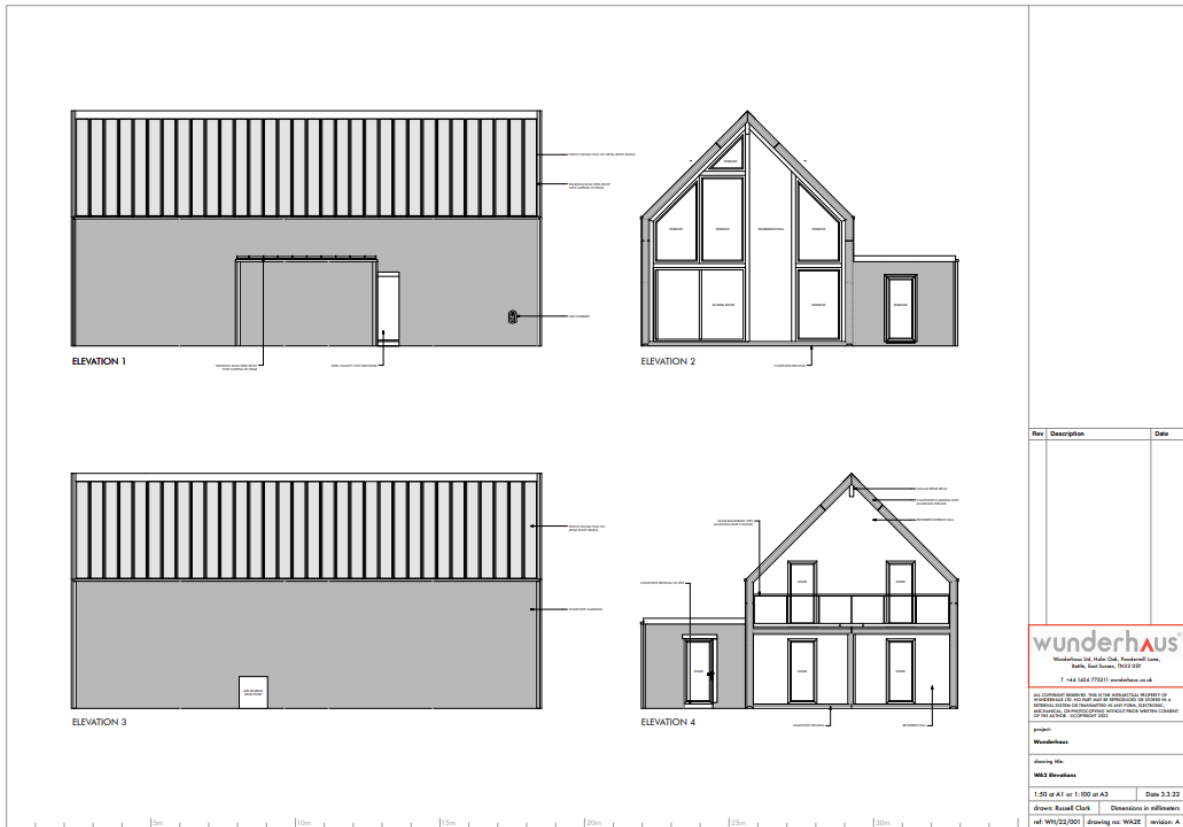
Plans Submitted for Current Application RR/2022/840/P
